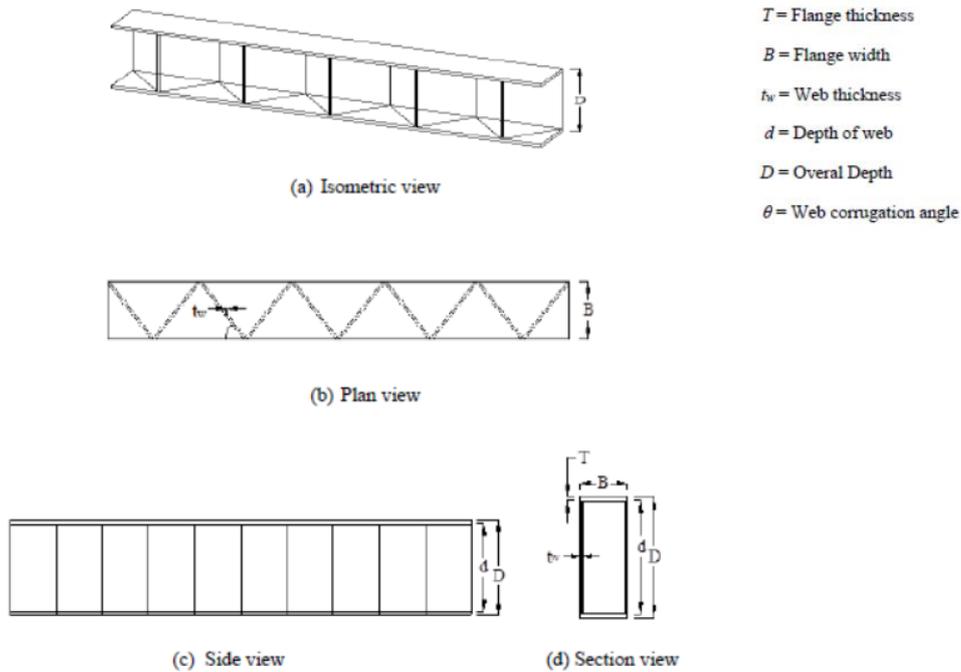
Shape and dimensions of a typical TRIWP section (all units are in mm) (Hashim et al. 2011)
